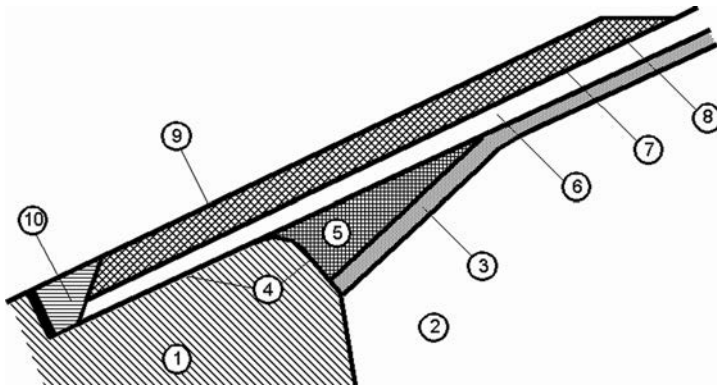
Joint without expansion connection (German Association of Soil Mechanics and Foundation Engineering). (1) Concrete; (2) compacted rockfill; (3) asphaltic leveling layer; (4) coating; (5) asphaltic concrete wedge; (6) asphaltic concrete layer; (7) geotextile; (8) asphaltic concrete protective layer; (9) mastic; (10) sealing compound.
